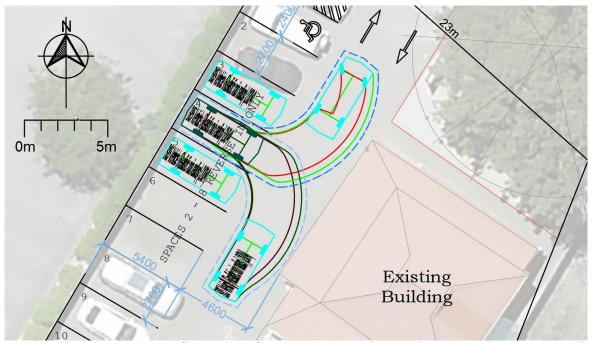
B85 reverse entry / forward exit for existing external car parking area adjacent existing building
